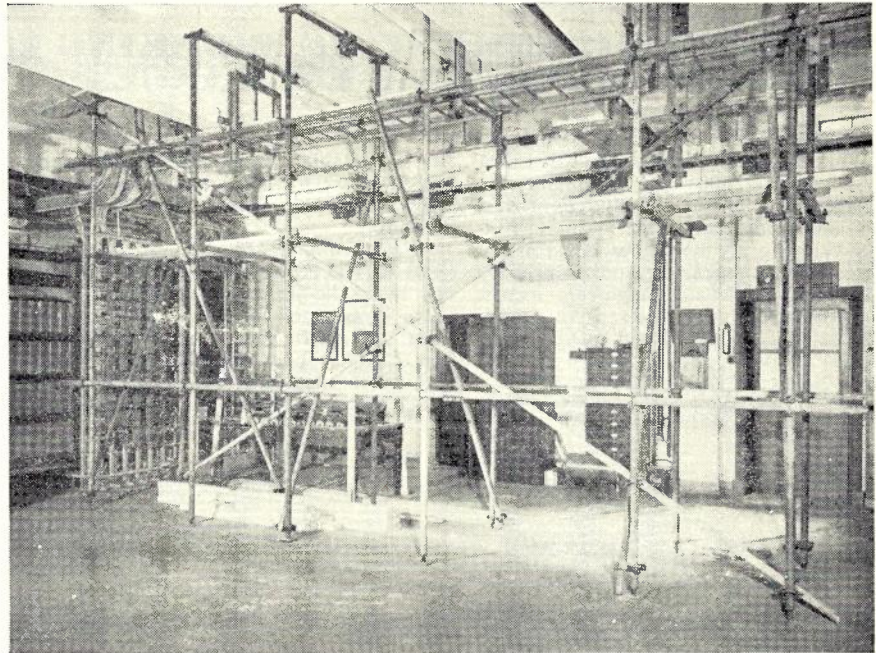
Runway after elevation, showing cables hanging loosely over one of the new bends.
